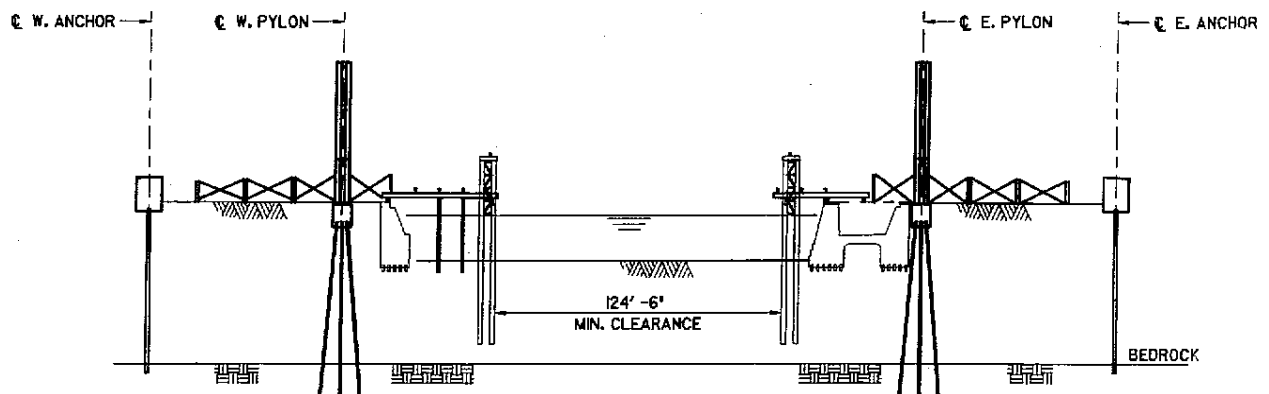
Bridge Elevation Prior to Center Span Lifting System Installation, *Courtesy of McHugh Construction / Bridge Concepts*³
